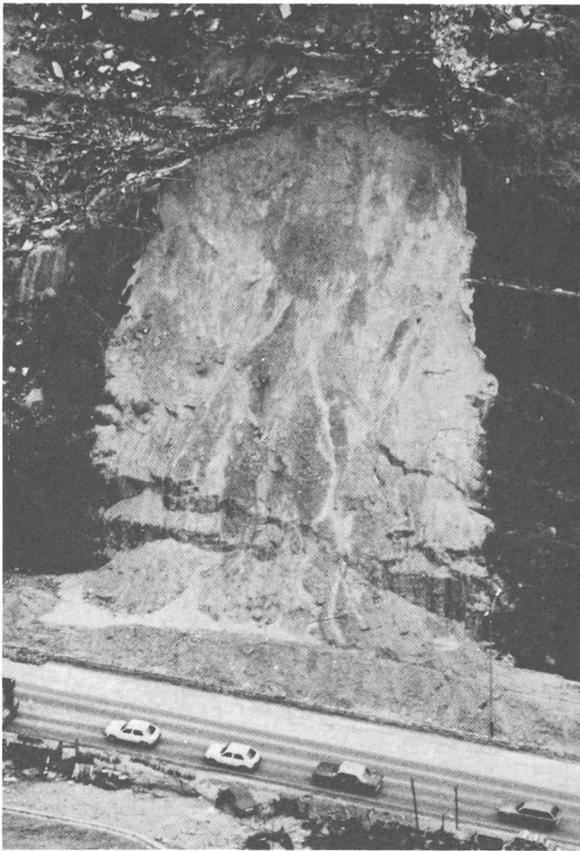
Typical Hong Kong Soil Cut Slope Failure Caused by Heavy Rainfall
